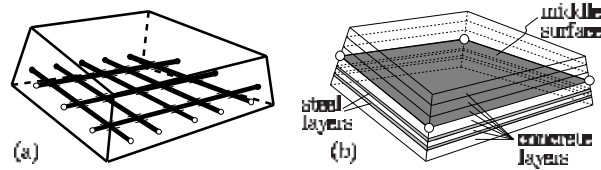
Illustration of employed layer concept [2–4]: (a) real cross-section, (b) layered finite element
